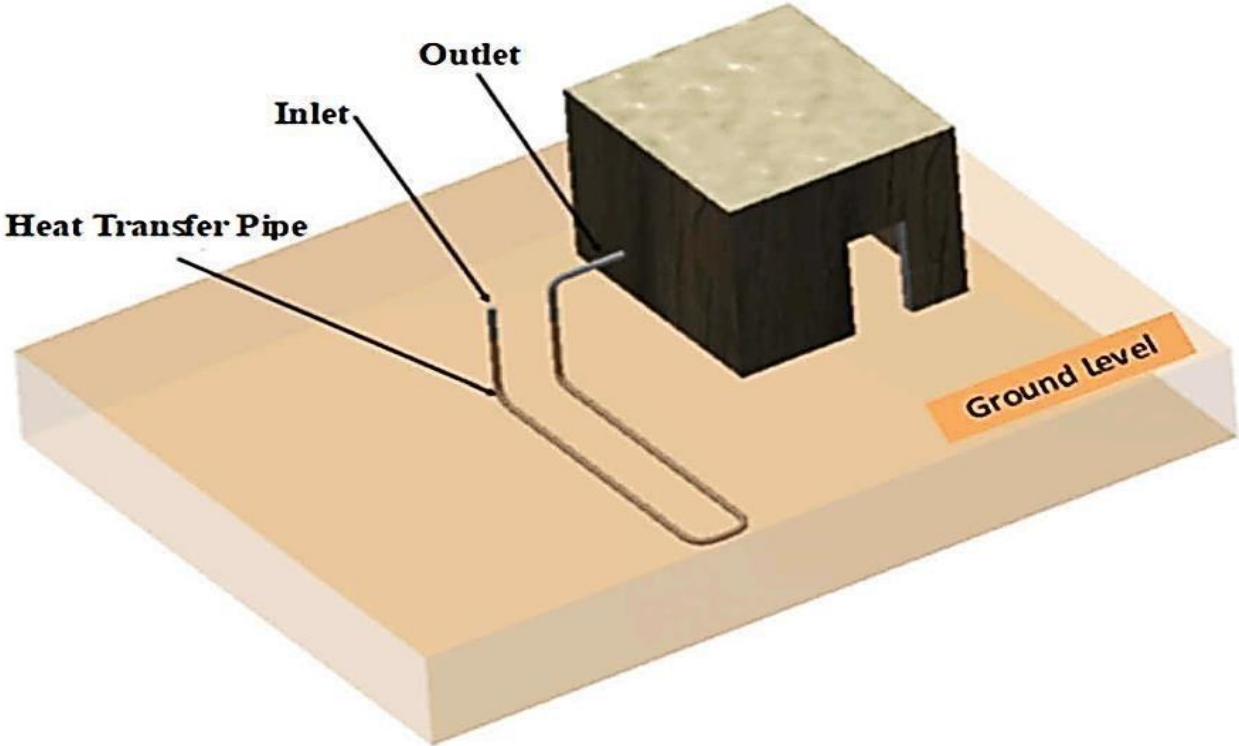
U-shaped pipe-layout for GAHE system[31]
